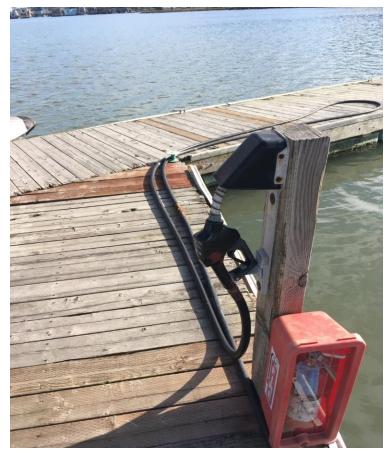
January 31, 2020. Staff photographs depicting unauthorized docks (cross-beam, three fingers), two pilings, and on water fueling facility.
